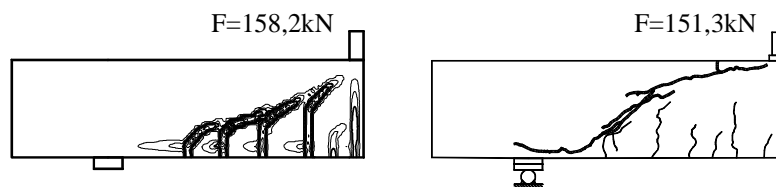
Crack propagation at failure of test beam 1K1 from Non-FEM and test
